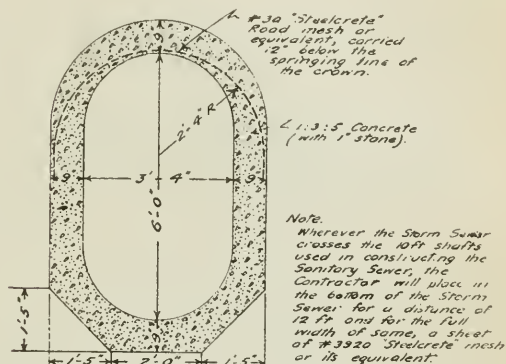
Typical Cross-section of Storm Sewer on Queen Street
